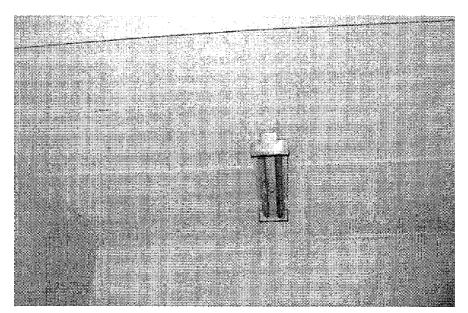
Example of asbestos cement sheeting located on the ceilings of the kitchens on the ground floors at the rear of residential tenancies 89A-D and 91A-B Liverpool Road.
